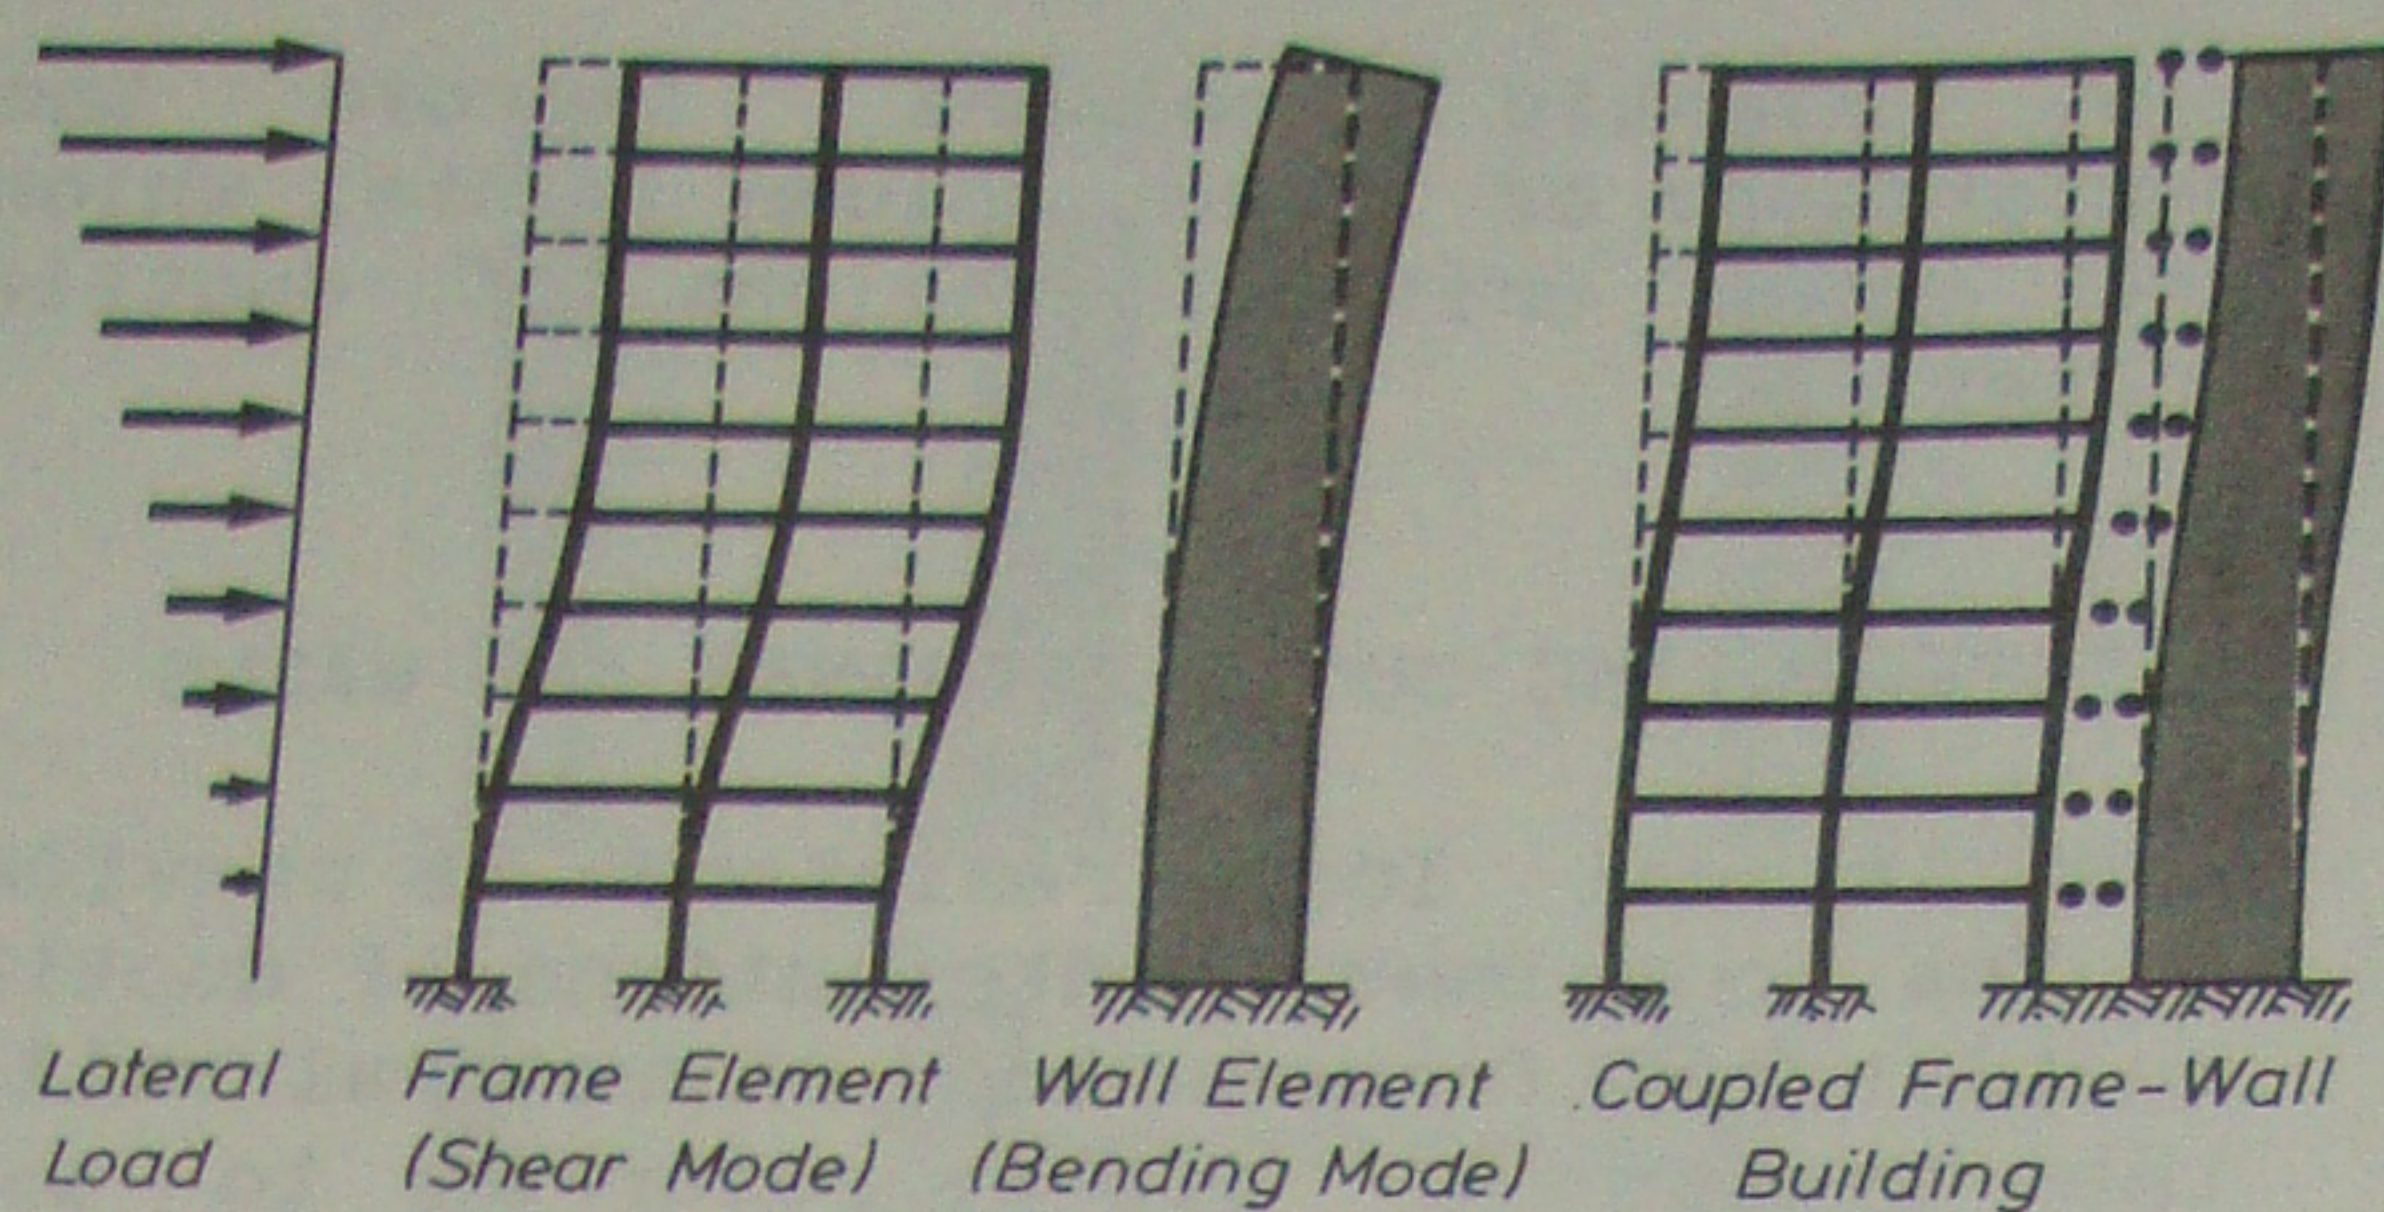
Deformation patterns of laterally loaded frames, walls and coupled wall frame elements
